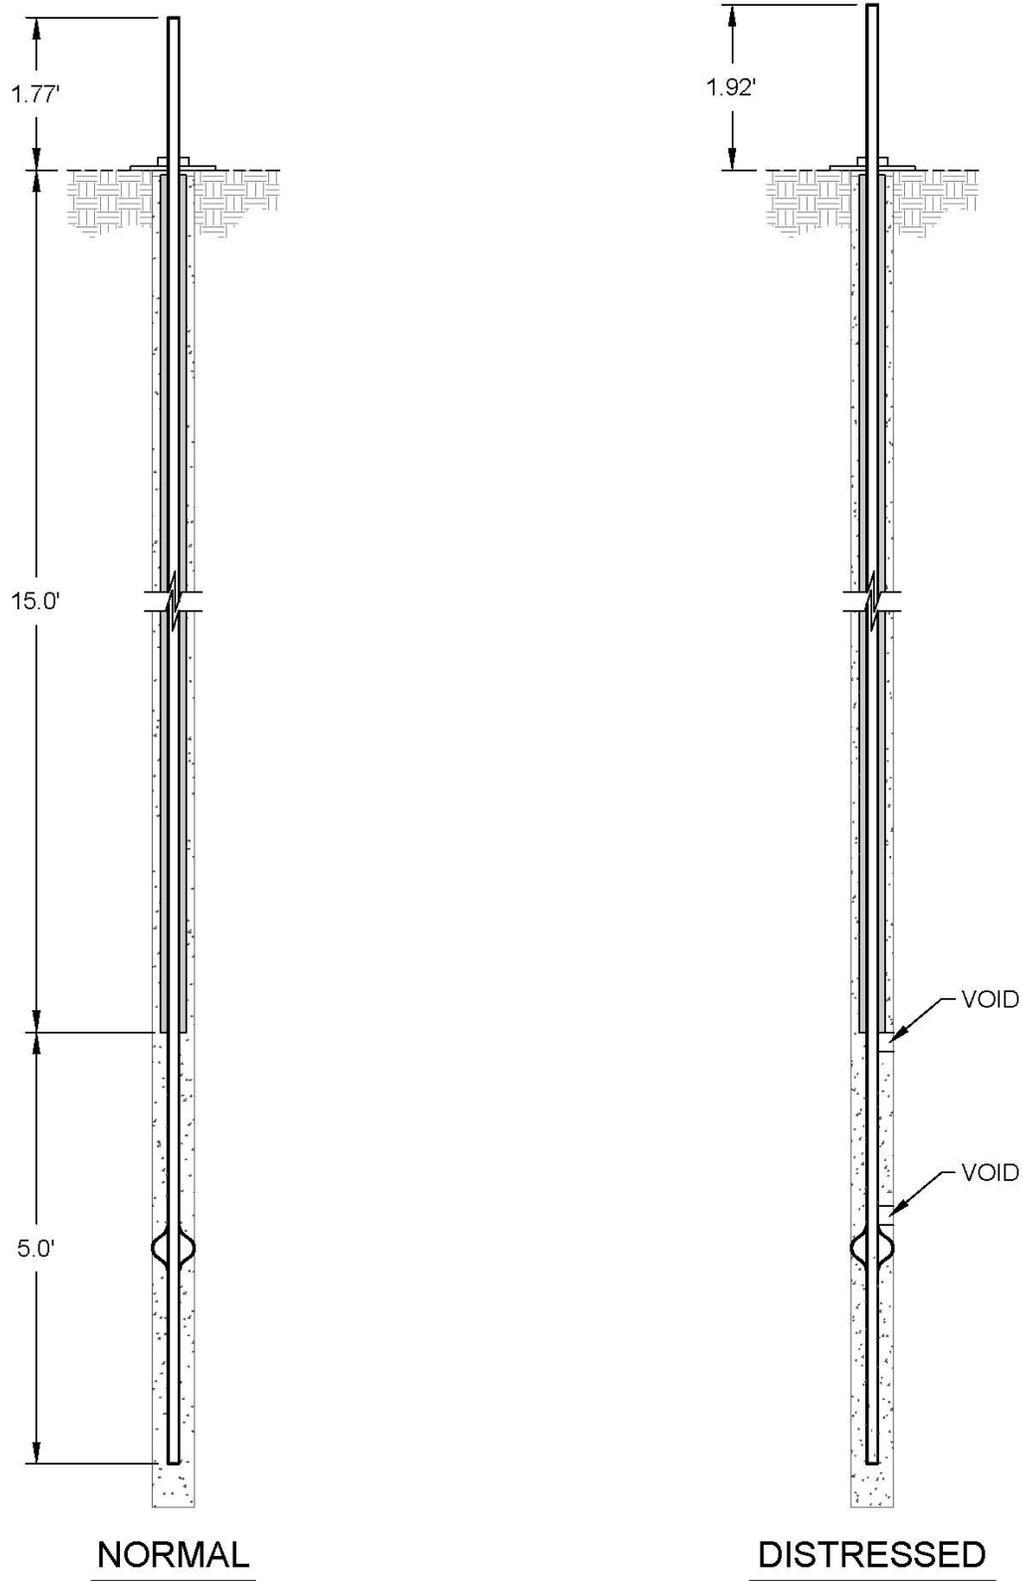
(c) Sketch of 20' long dummy rock bolt installations.
